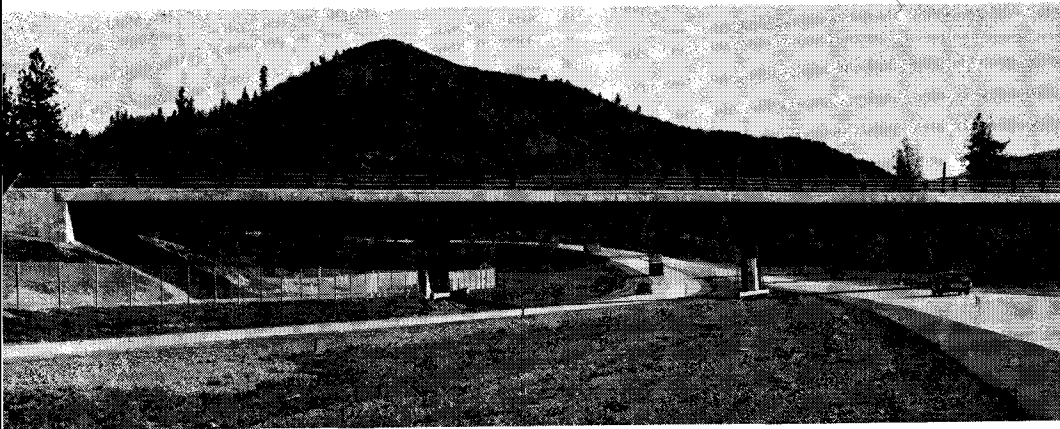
Antler Underpass. Three-span continuous through-girder railroad bridge.
